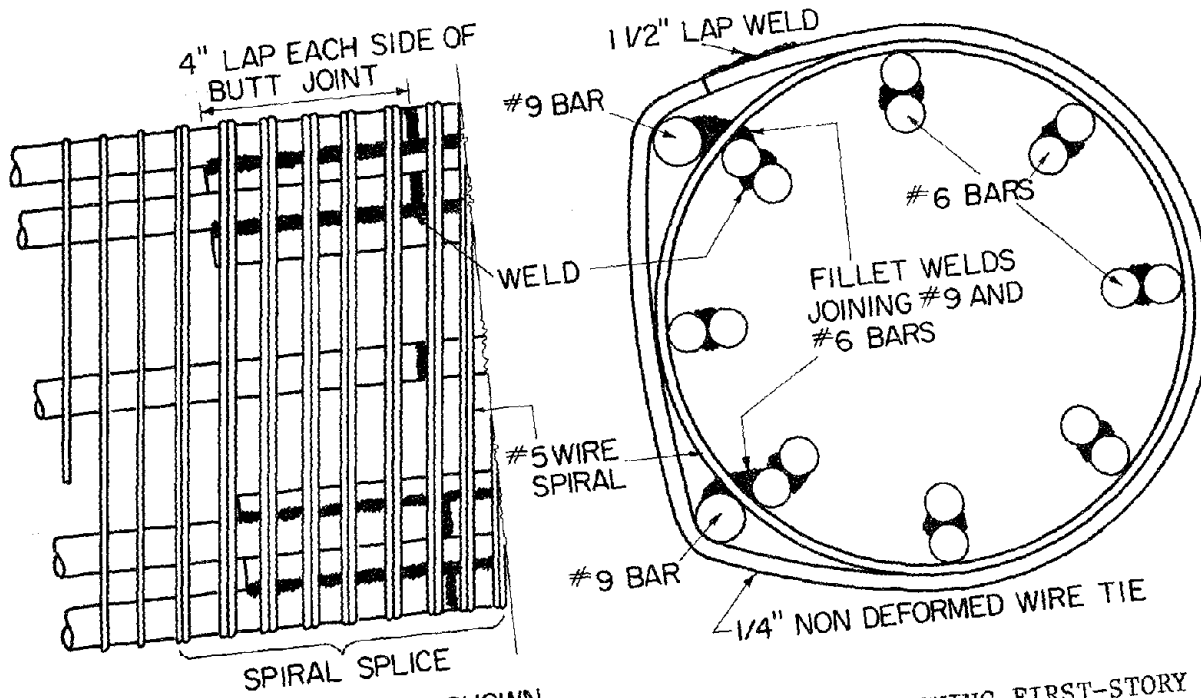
FIRST-STORY REPAIRS ON SPECIMEN SW7 AFTER FAILURE OF SPECIMEN SW7 EPOXY-REPAIRED.
